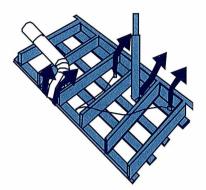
Recessed lights, wiring, plumbing and other openings in insulated ceilings and walls can result in a tremendous amount of heat loss.
